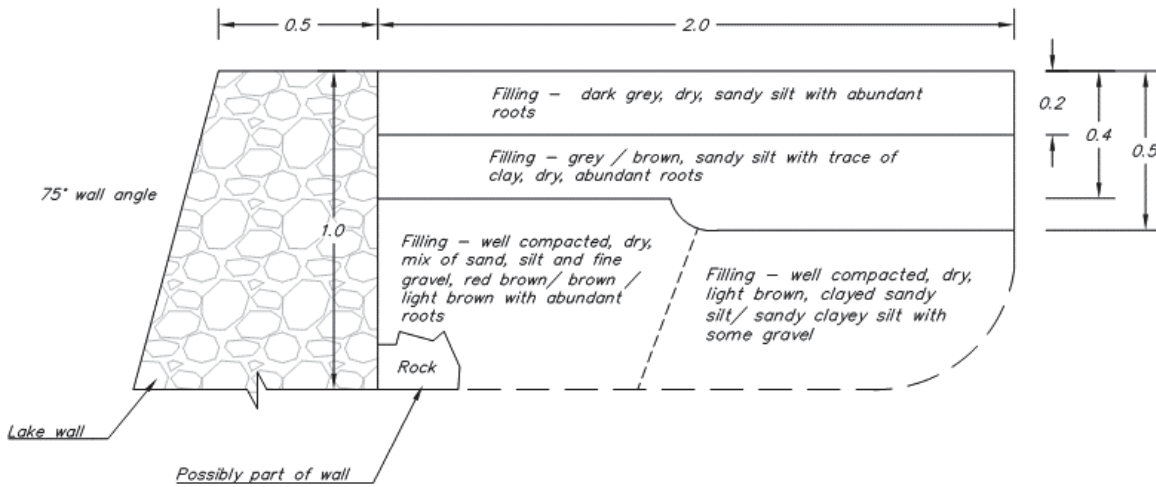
Test Pit Cross Sections (source: Douglas Partners)
